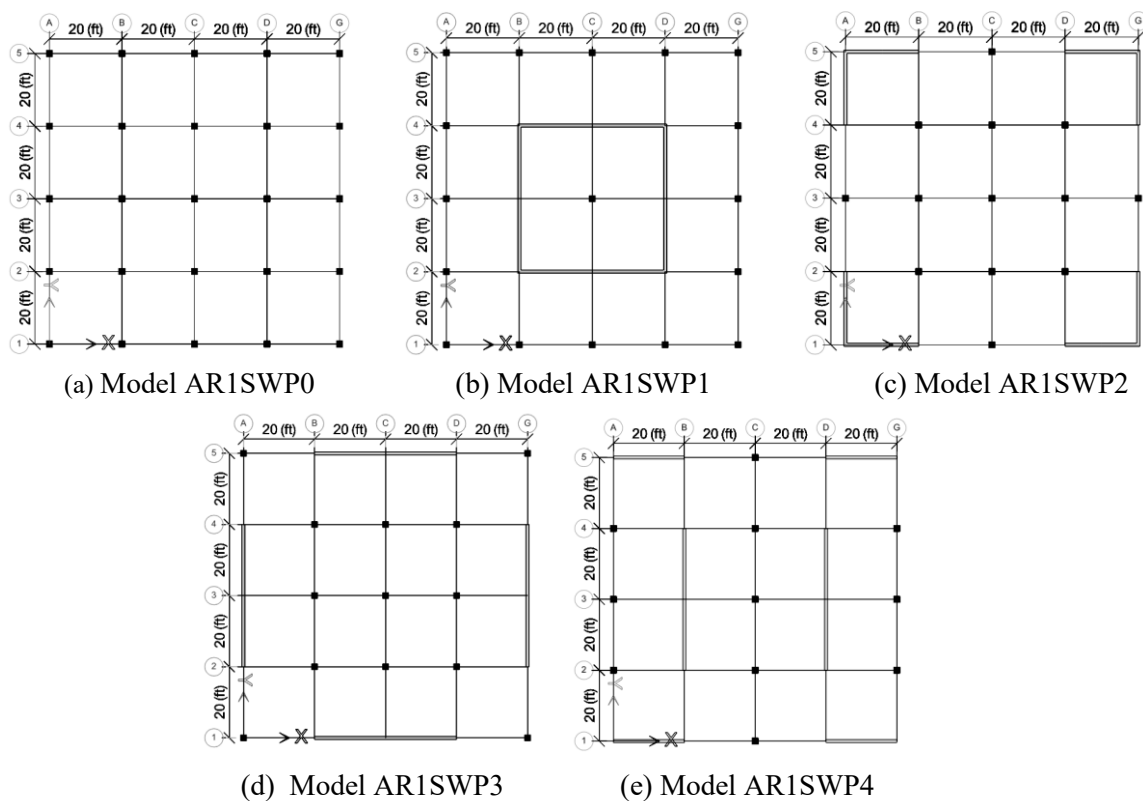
Shear-wall layout plans for aspect ratio 1:1
